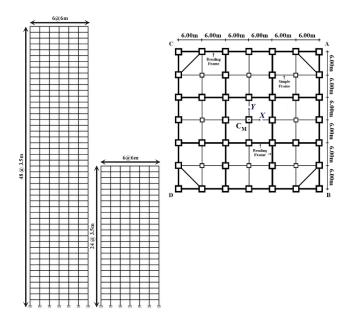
Plan and elevation of the 24 and 48-story studied bundled tube structures
